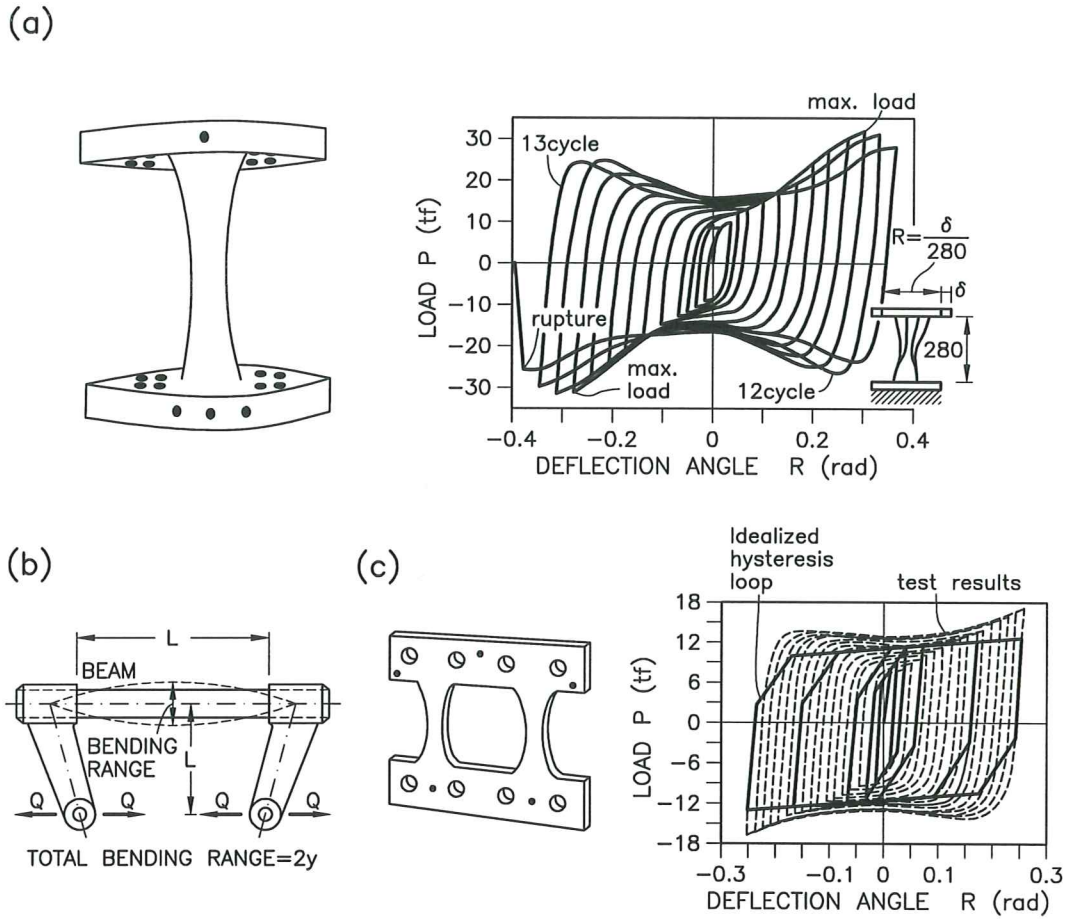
Dissipators for metal plastification. (a) Joint Damper System. (b) Bell Damper. (c) Honeycomb.
